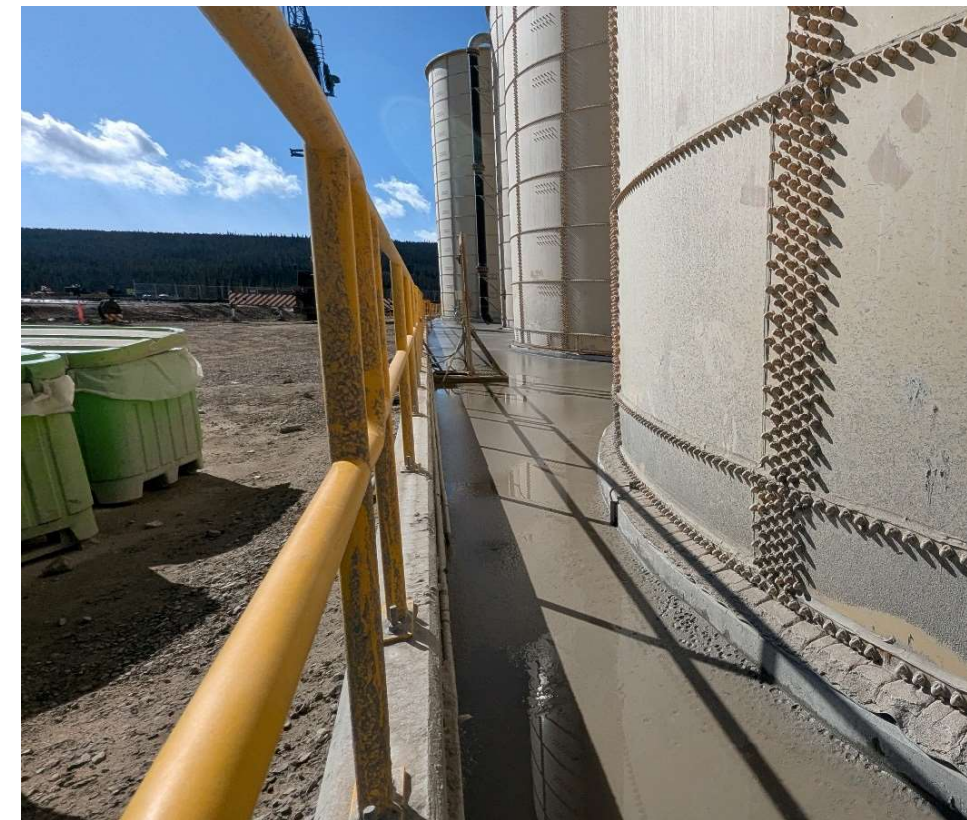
Process slurry (containing cyanide) being temporarily held within the engineered concrete secondary containment structure surrounding the tanks during maintenance at the Plant Site.
